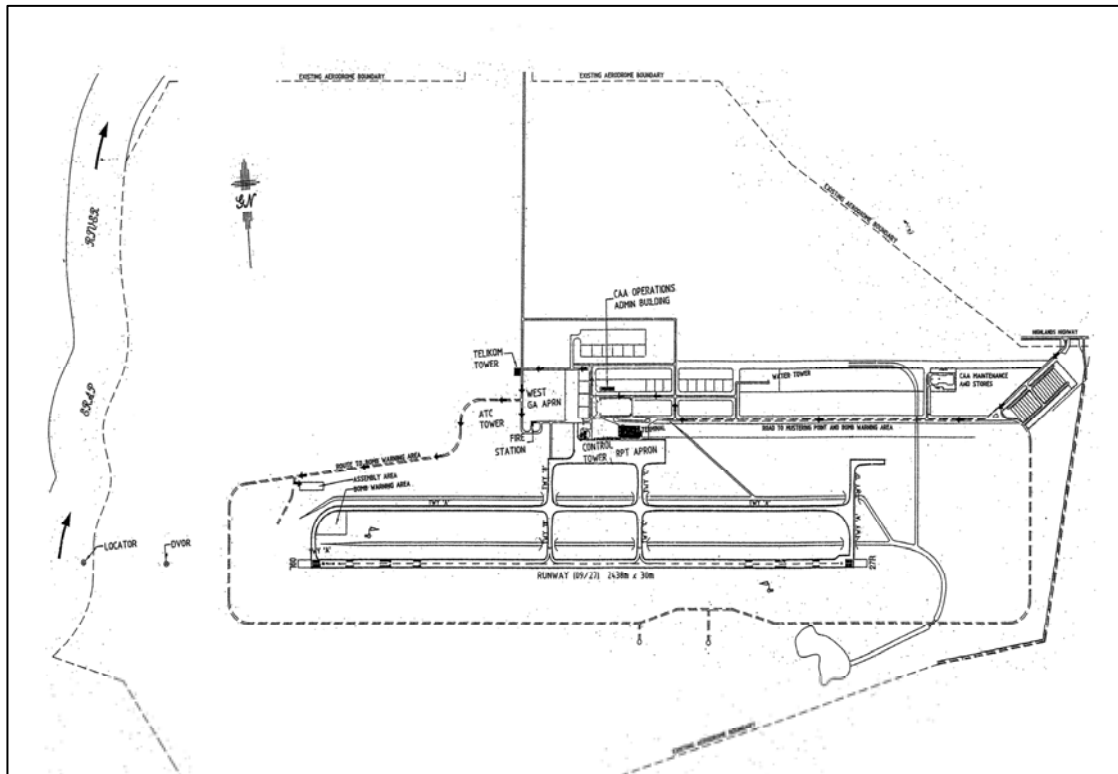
Ground Plan of Lae (Nadzab) Airport
